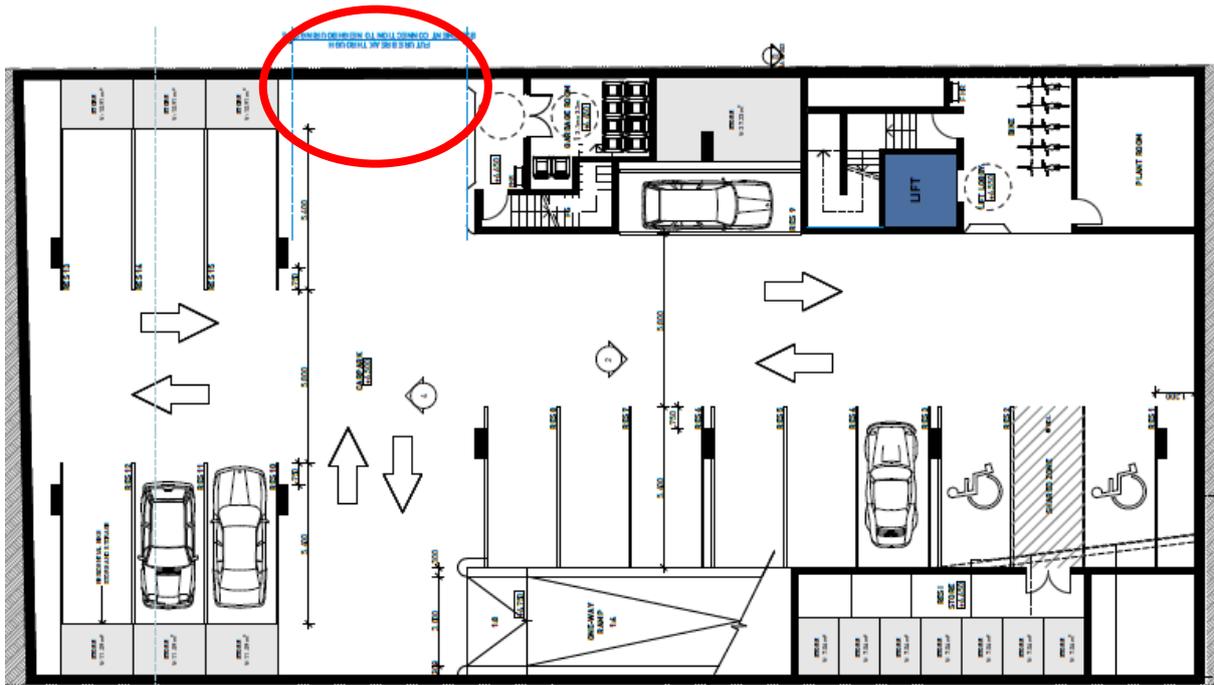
Basement plan of 19-21 Eve Street with breakthrough panel circled.
